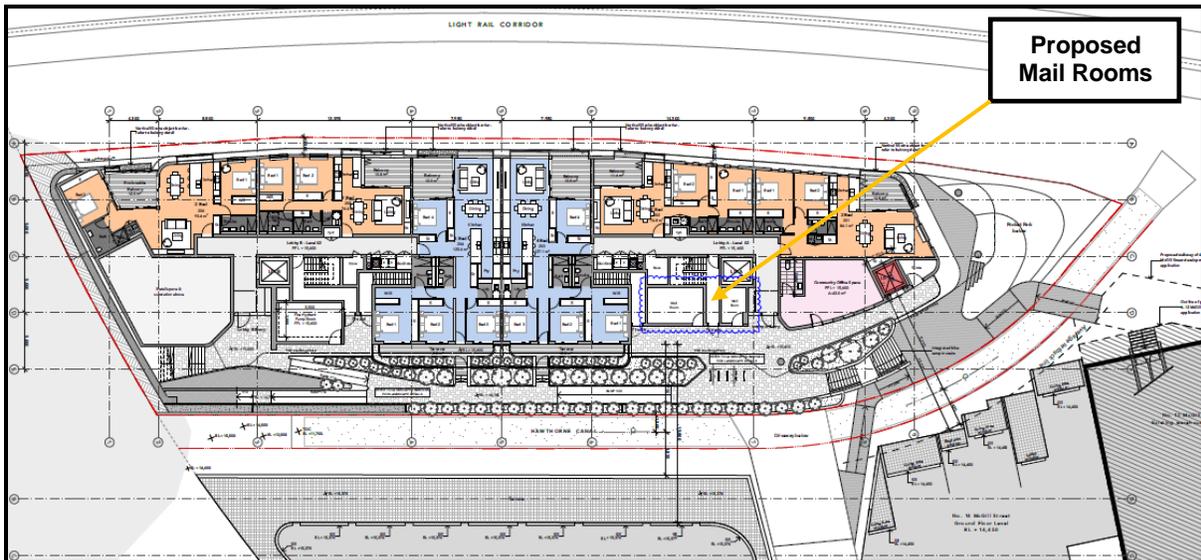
Excerpt Level 2 Floor Plan illustrating refuge room deleted and replaced with Mail Rooms
